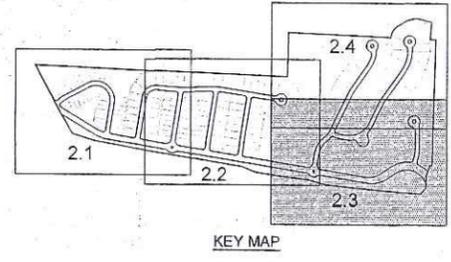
Jones Property Development (Engineering) Site Development Plan (Grading) P1404138.dwg Plotted on: Sep 16, 2016 - 5:12am Plotted by: jfranklin
